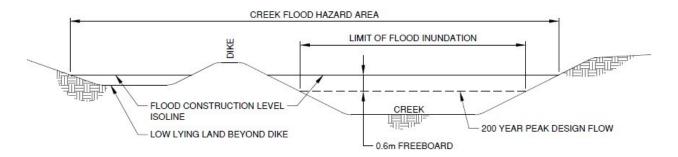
CREEK SECTION AND FLOOD HAZARD AREA BEYOND DIKE
